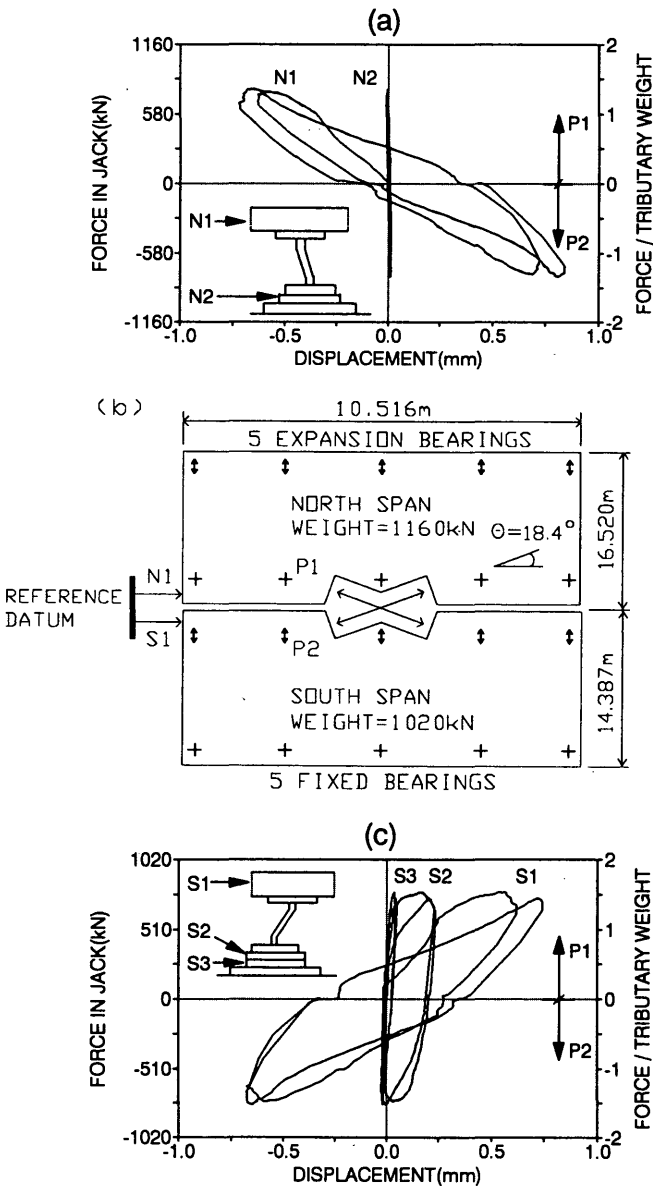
Transverse test results on the Niagara Parkway bridge: (a) north fixed bearing over the pier; (b) plan view of the bridge; (c) south expansion bearing over the pier.
